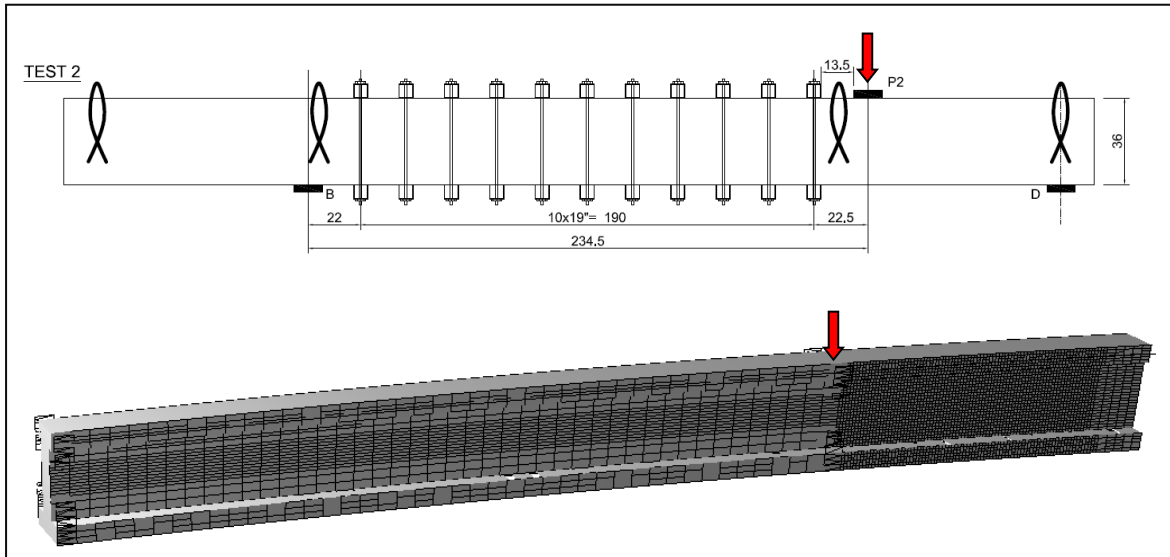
Beam 2 Test 2 Model (dimensions in inches).
